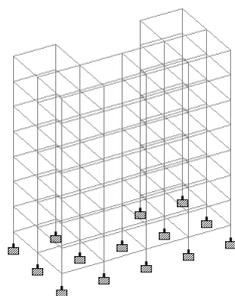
3d rendered view of L-shaped building (Model 2)
